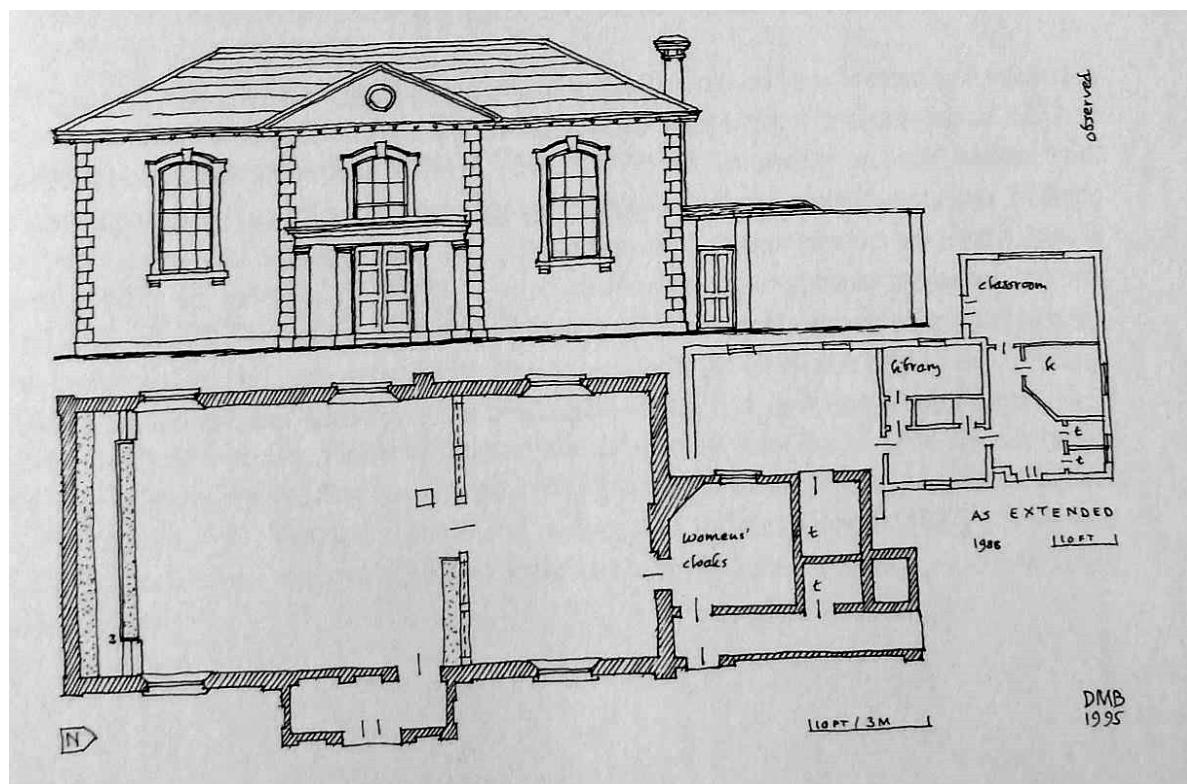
Elevation and plan, from Butler, p. 575 (plan of new extension not shown as built)
